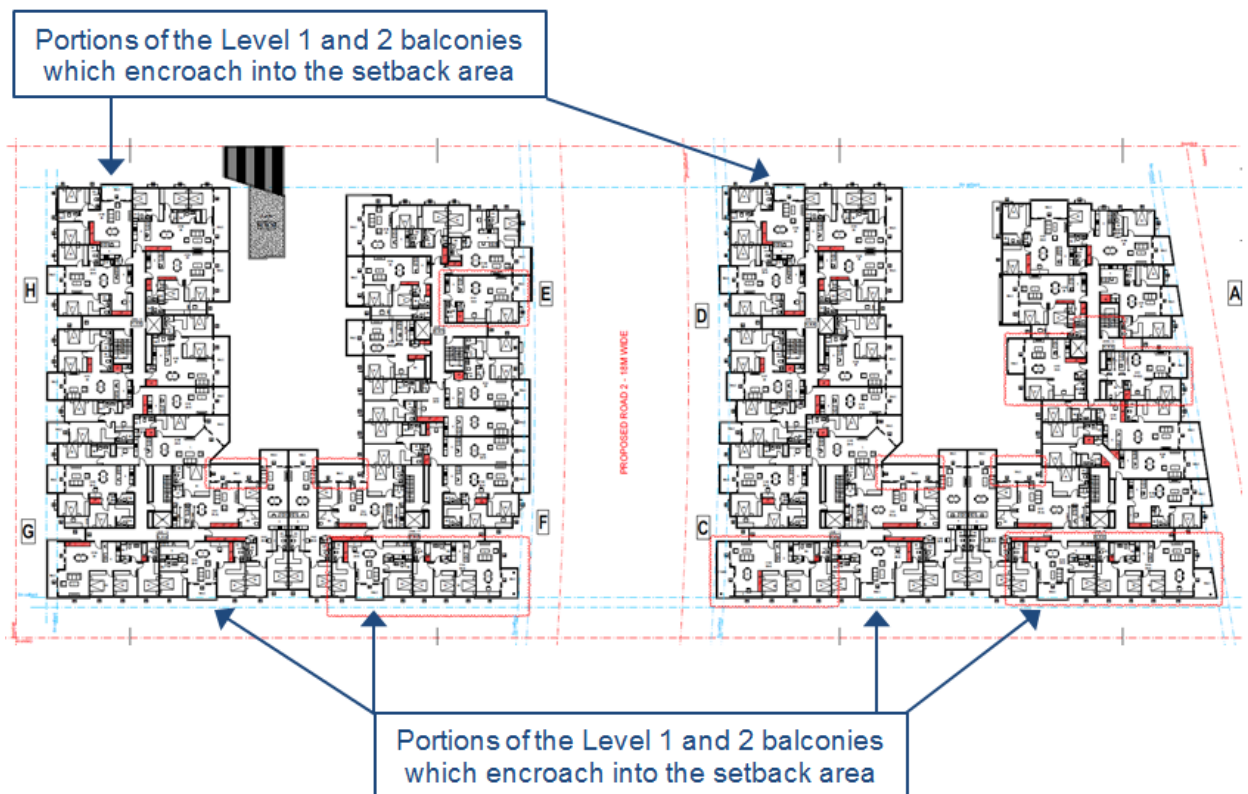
Extract from the Level 1 and 2 Floorplan identifying the balconies which encroach into the minimum required 6 m setback/building separation by 300 mm.
